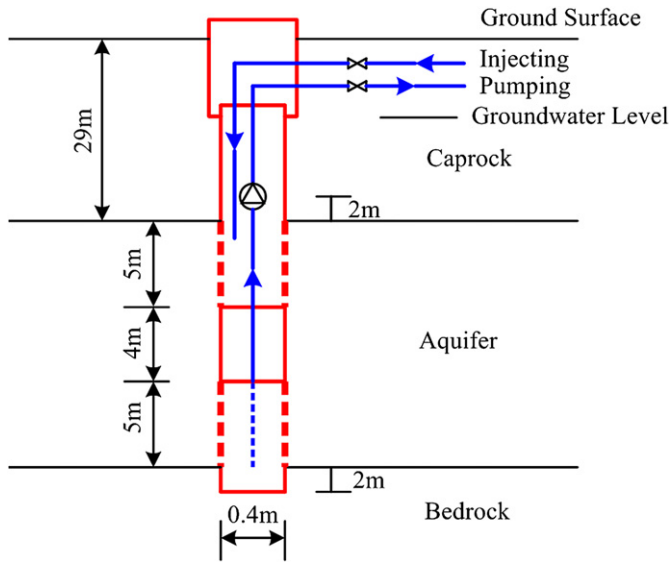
The dimensions of the test single-well in the campus of Technical University of Denmark.
